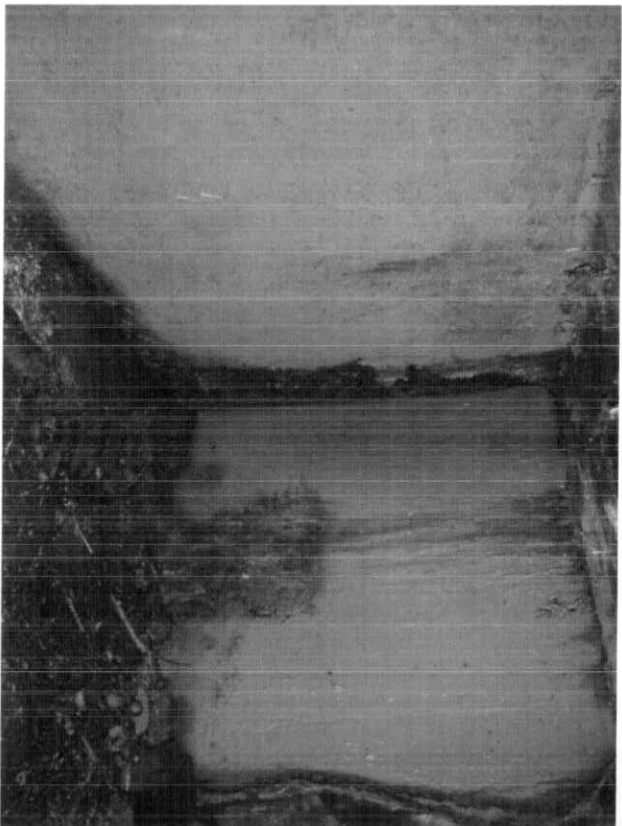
BEAM END # 6 NORTH FACE AT ABUTMENT # 1.
